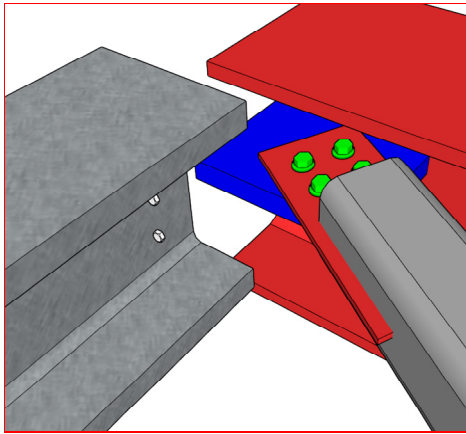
Overview of the modified horizontal trusses with their connections to the truss chords and the beams in the longitudinal direction.
